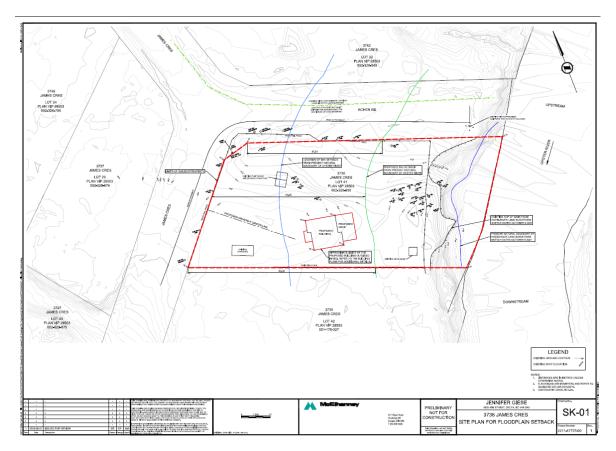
Site Plan, illustrating proposed location of house (red), with 30 m setback (green) and 60 m setback (blue) from Oyster River
